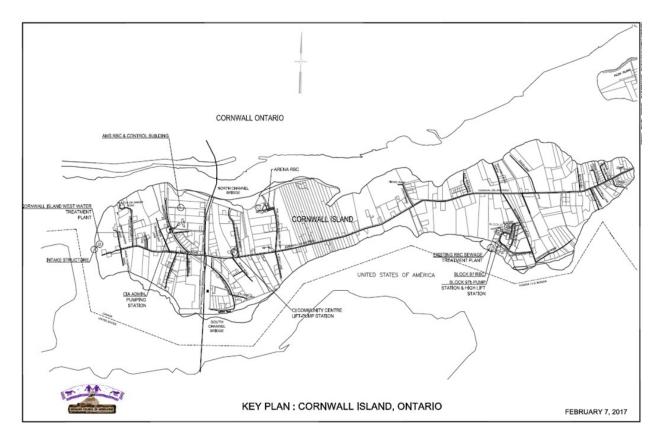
Key Plan of Cornwall Island Water and Waste Water Facilities
